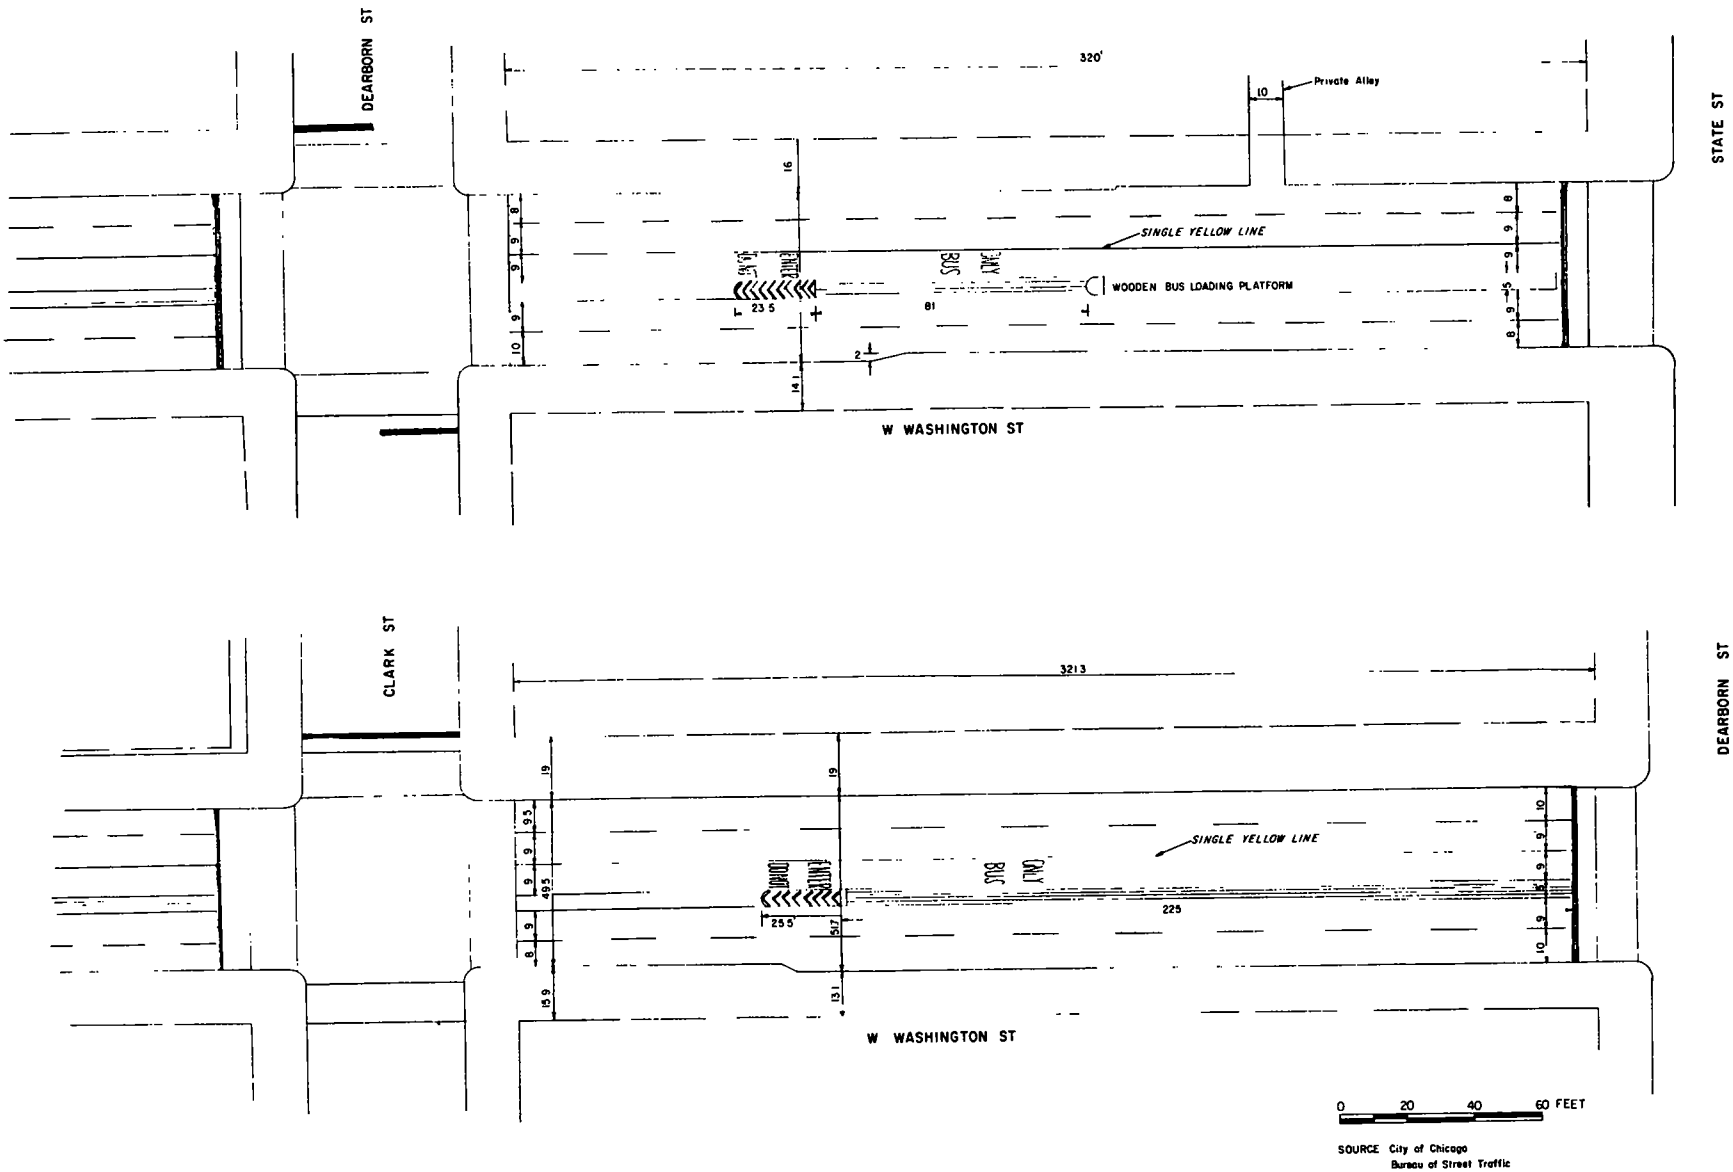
Lane marking plan, Washington Street bus lane, Chicago, Ill.
